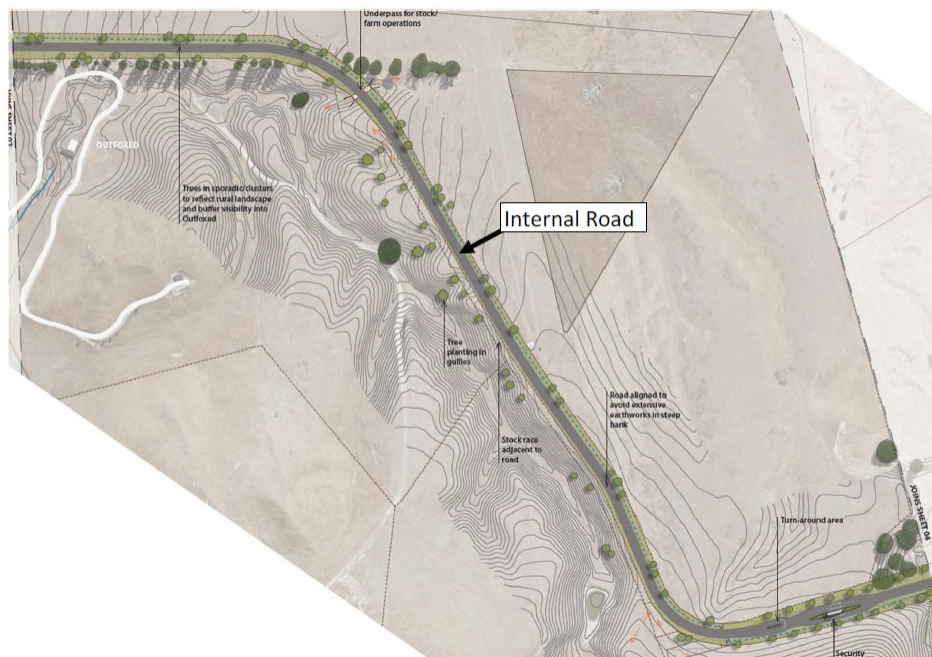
Private Road Access Concept Design – Central Section (Source: Wayfinder)
